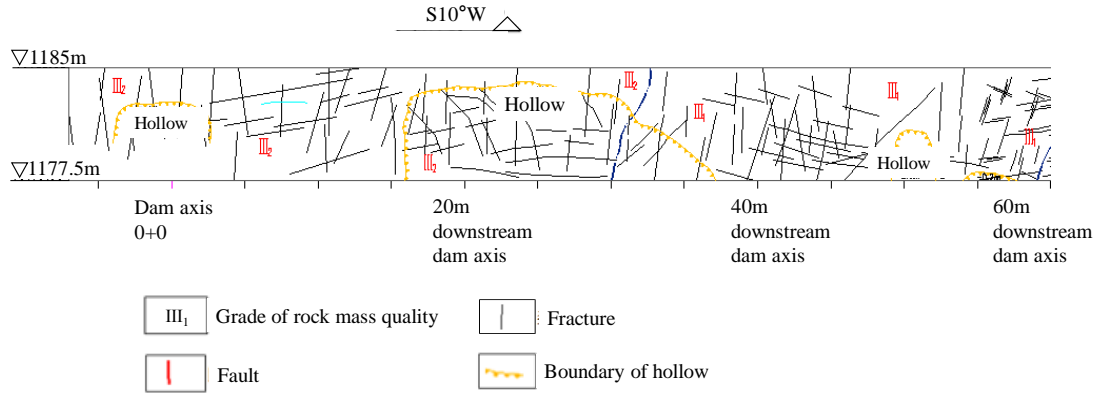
Developed sketch of structural surface on left groove wall with elevation from 1177.5 to 1185 m
